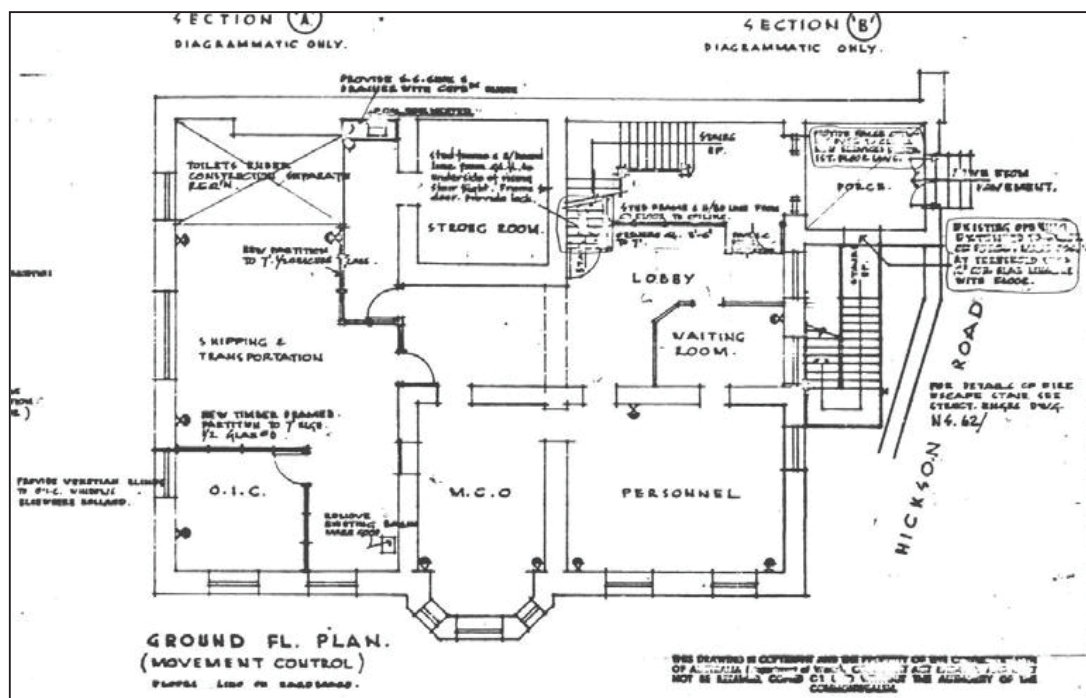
Reproduction of 1962 ground floor plans by Commonwealth of Australia Department of Works
